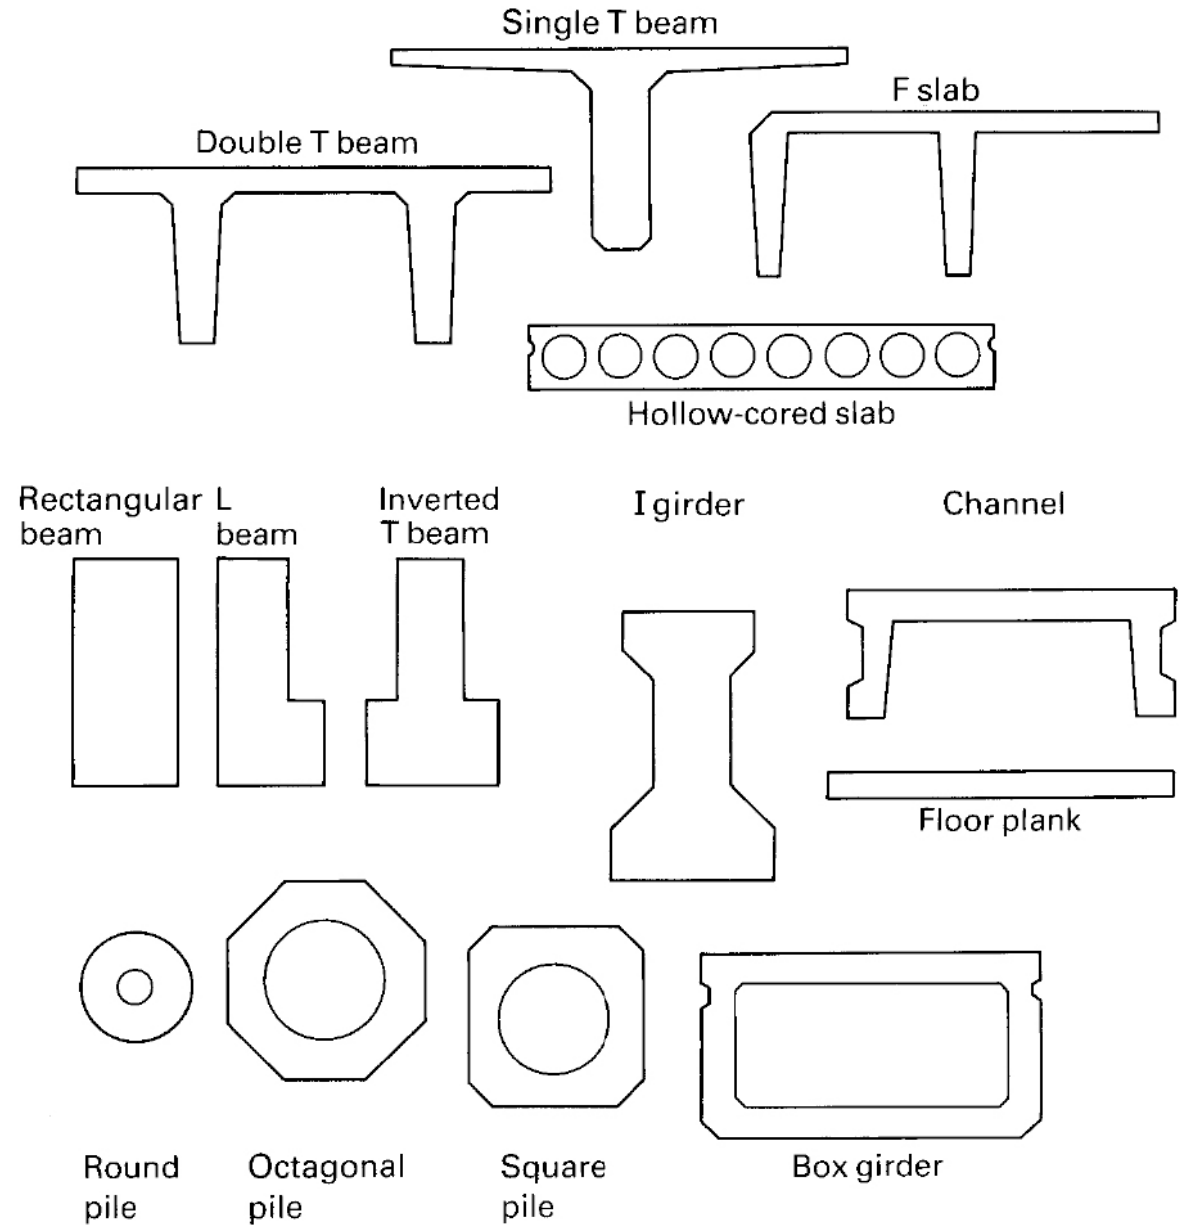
Typical standard sections of precast prestressed concrete products in the United States.
